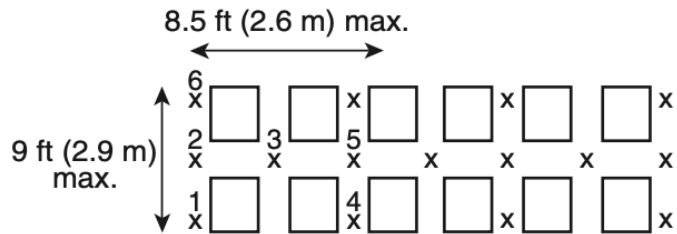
(d) Plan View of In-Rack Sprinkler Arrangement for Open Double-Row Racks Up to 9 ft (2.7 m) Deep.
